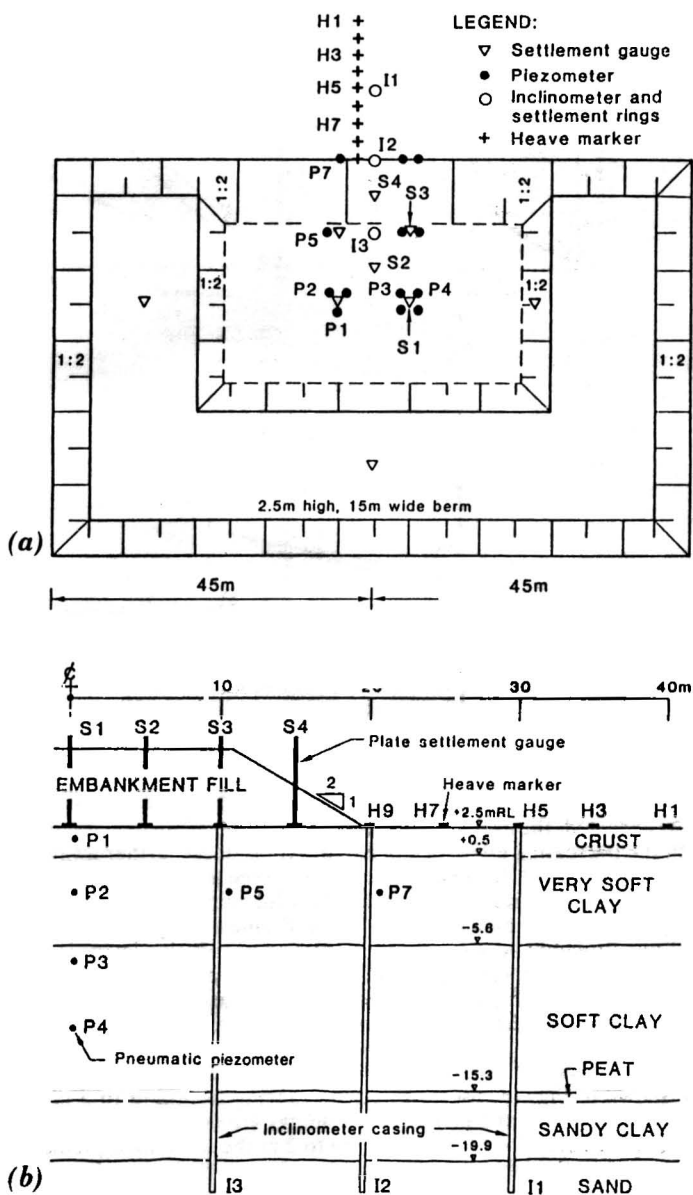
Plan and Cross Section of Muar Test Embankment Indicating Key Instrumentation
